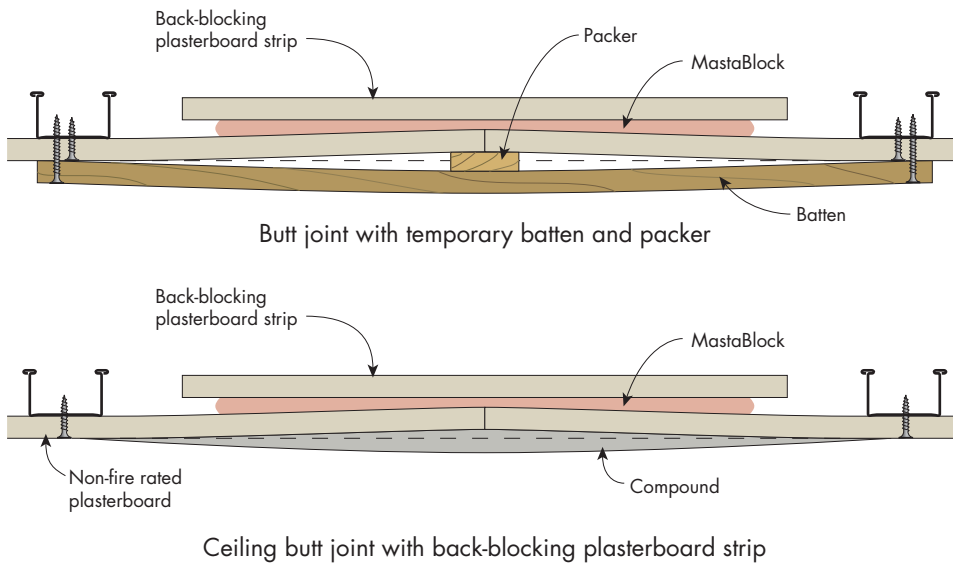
Creating a Recess at a Butt Joint – Elevation
